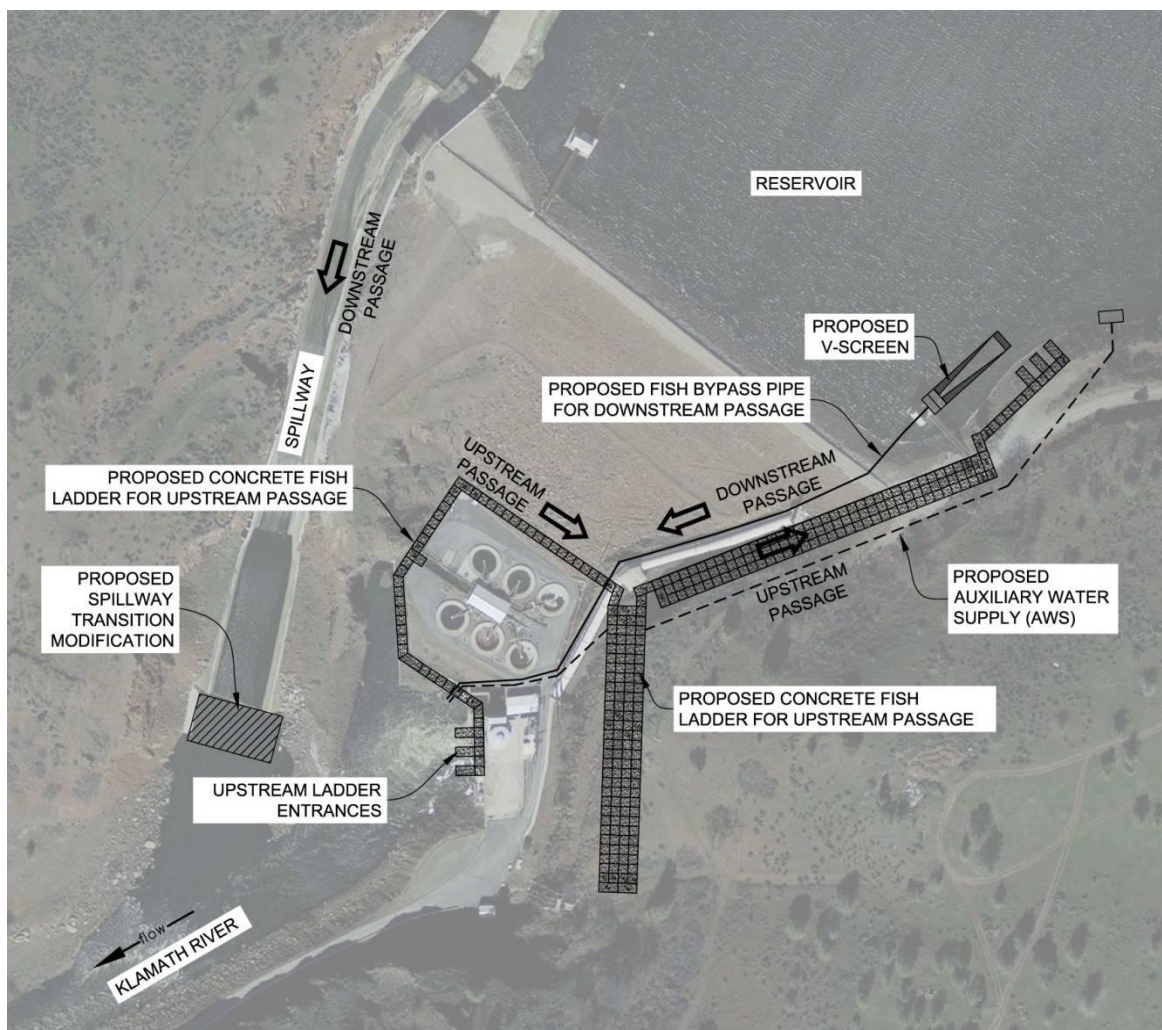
Conceptual fish passage facilities layout for Iron Gate Dam showing fish ladder, water intake screen, and spillway transition modifications
